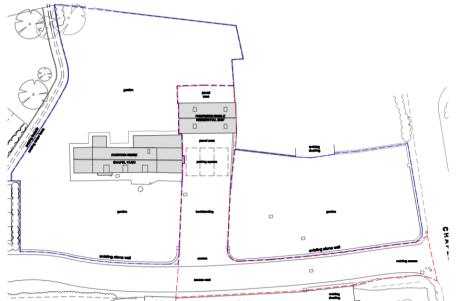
Sub-divided site (left to right 1. Farmhouse, 2. Replacement barn/dwelling, and 3. "Garden")
